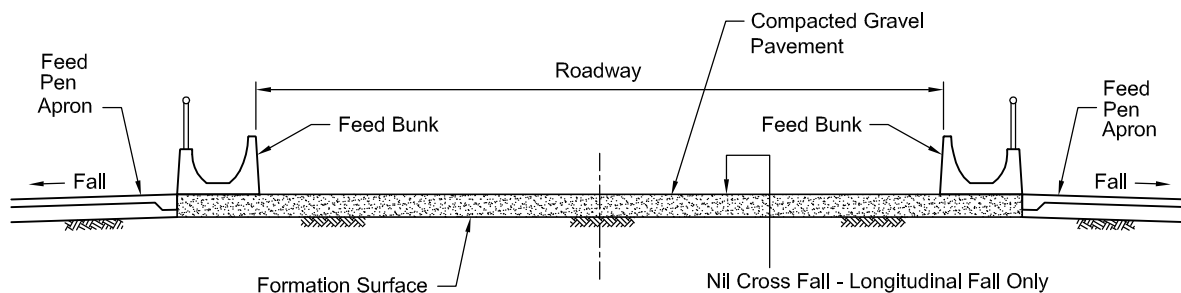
Typical unsealed feed road cross section with no cross-fall in back to back pen layout.
